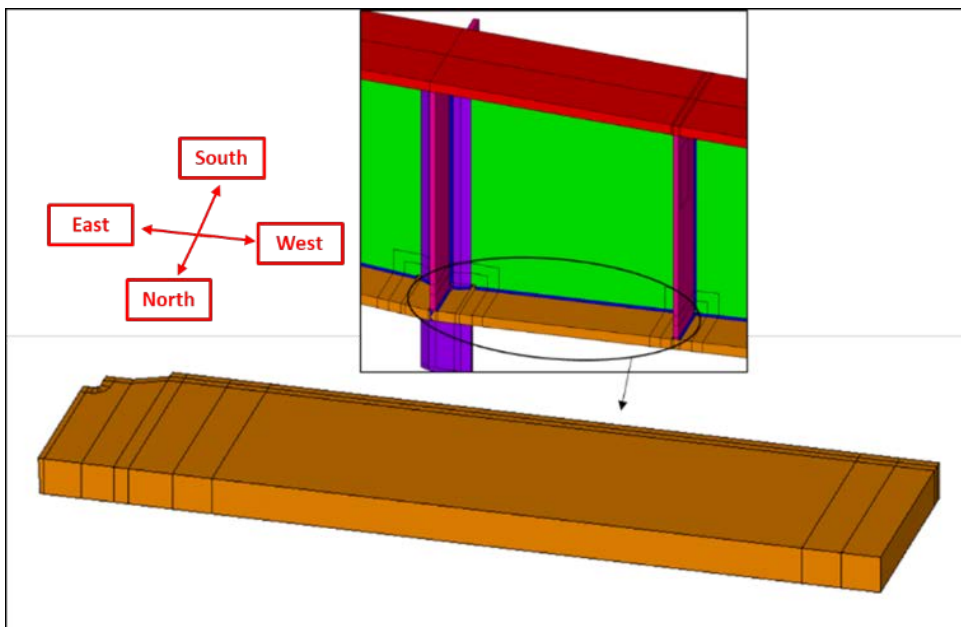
Section of bottom flange extracted from parent solid model for stress analysis under groove-weld-shrinkage loading.
